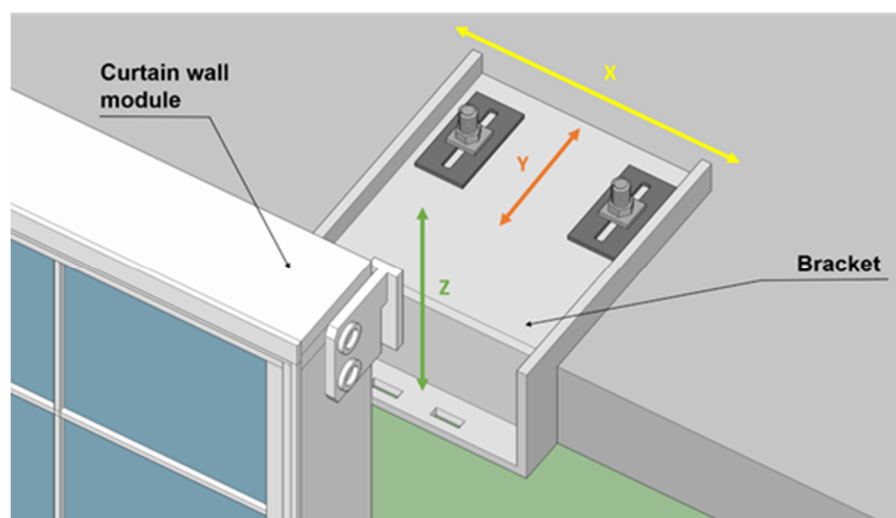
Schematic diagram of a typical bracket on the concrete building floor and its connection with a CWM module (the drilling technique).
